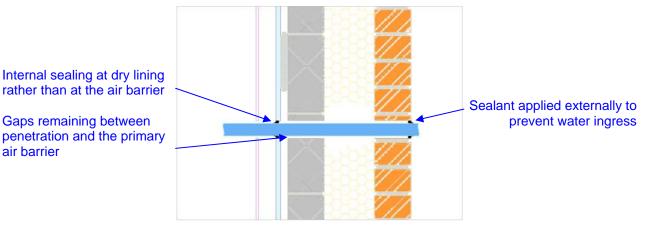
Typical sealing application of wall penetrations made after dry lining.
